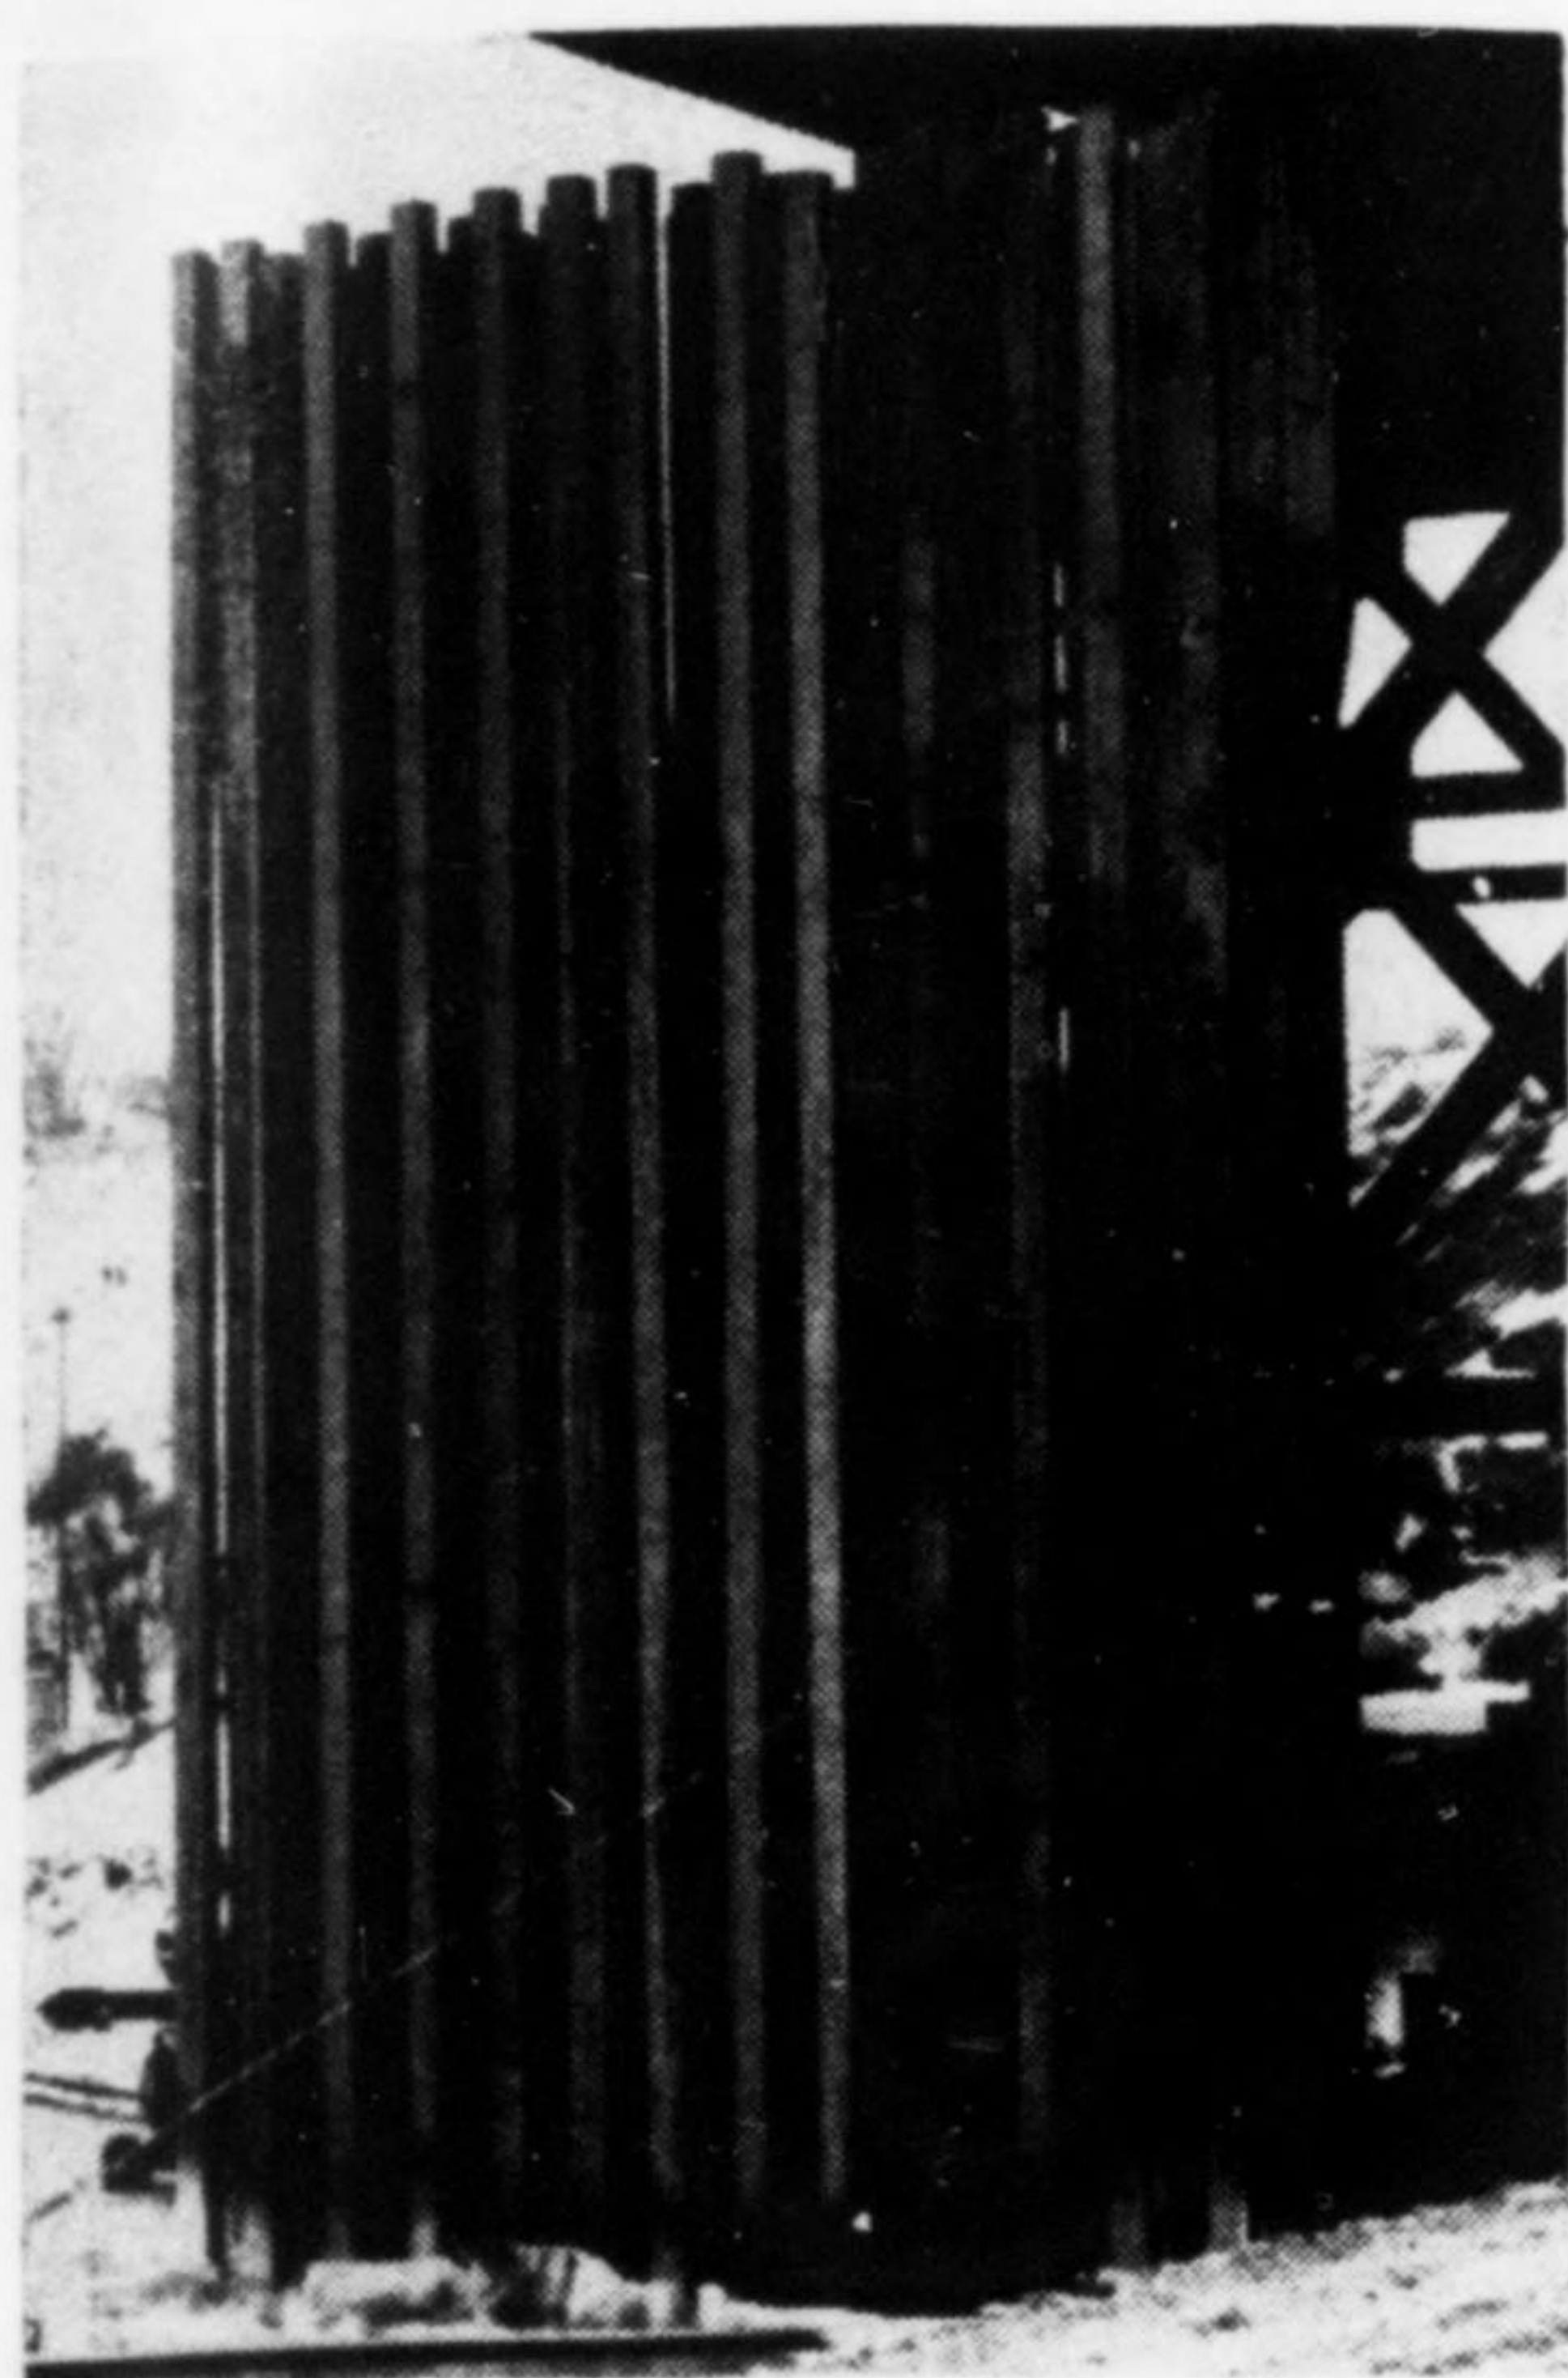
Only light bracing, welded on in the field, was required to hold the piles properly spaced while being encased with made-in-place concrete.
